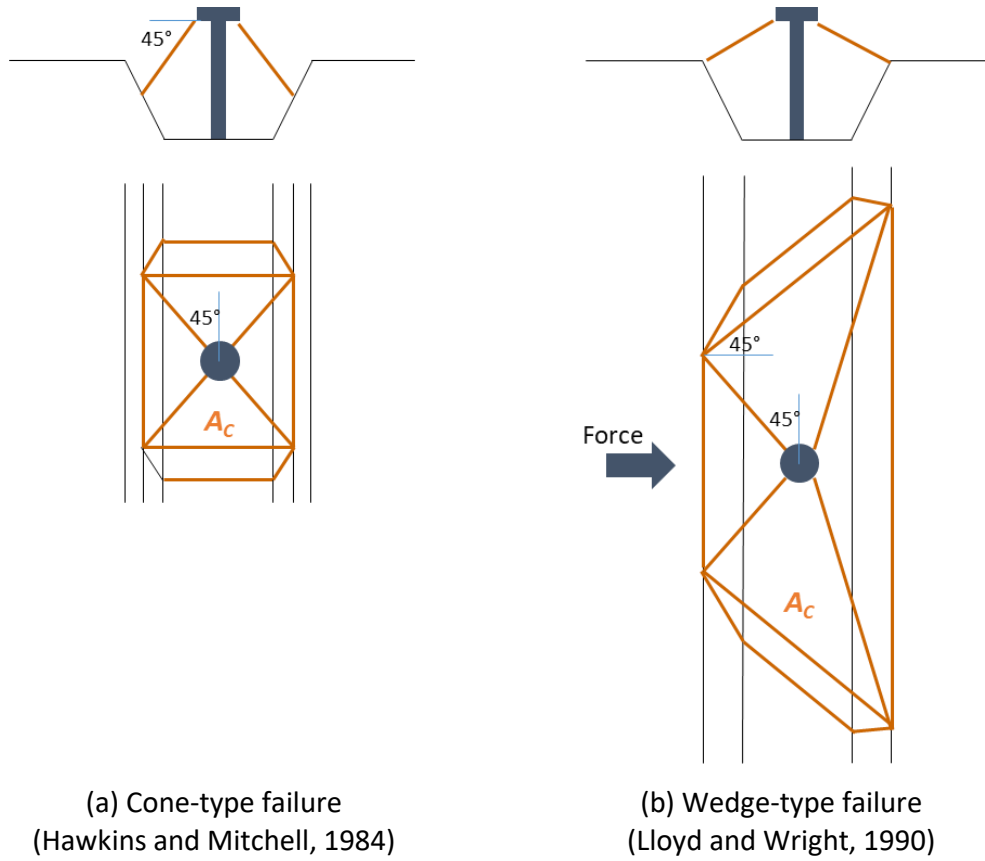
Concrete failure surfaces with respect to the shape of the failure
